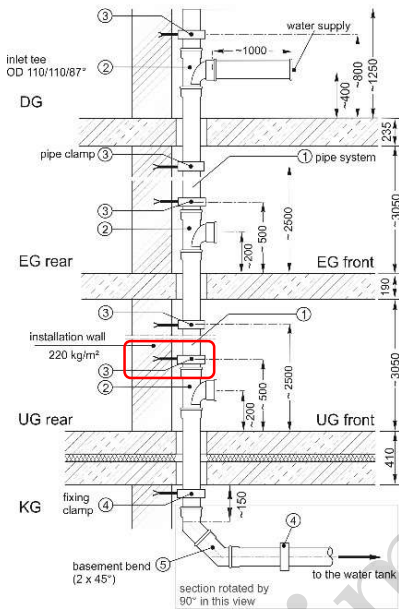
Test facility with the standard wastewater system set-up at Fraunhofer IBP, Stuttgart for measurements according to EN 14366-1 [1]. KG: basement; UG: test floor; EG: ground floor; DG: top floor. Red box: lower clamp on the test floor.
